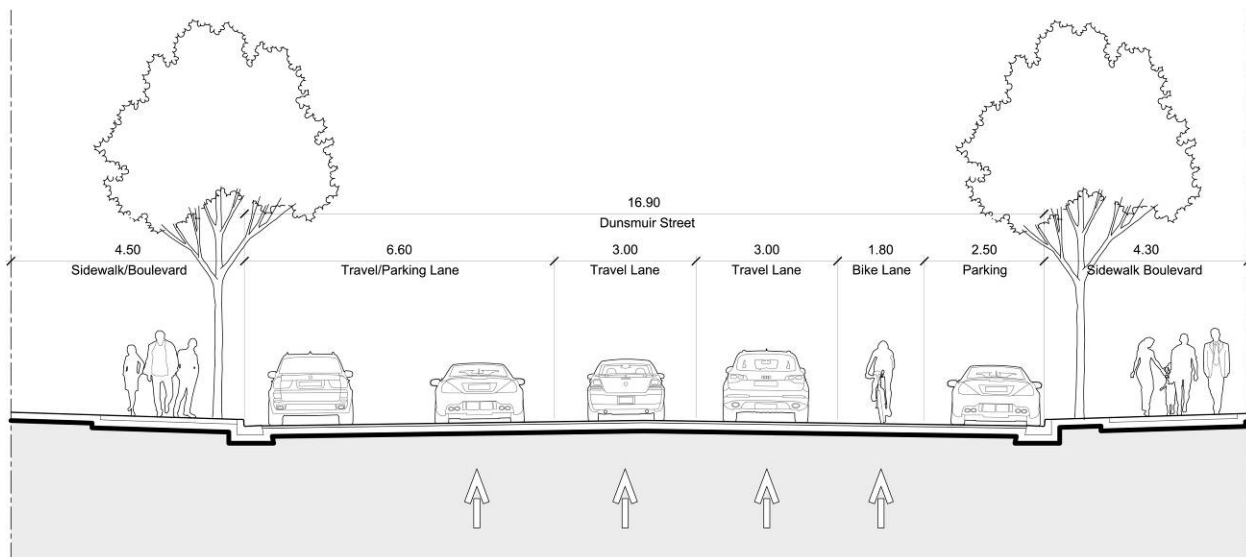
Existing cross-section of Dunsmuir Street between Beatty and Richards Streets (looking west)
